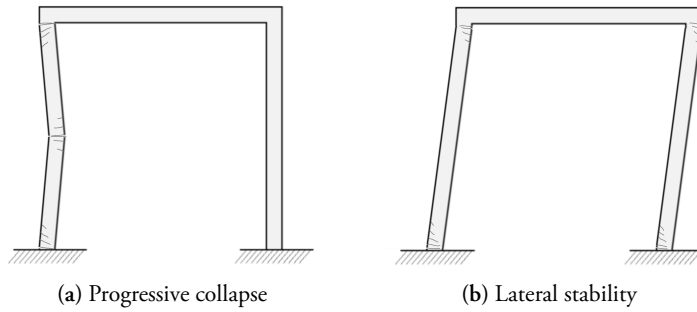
Example of failure modes for concrete frame structure subjected to blast loading.
